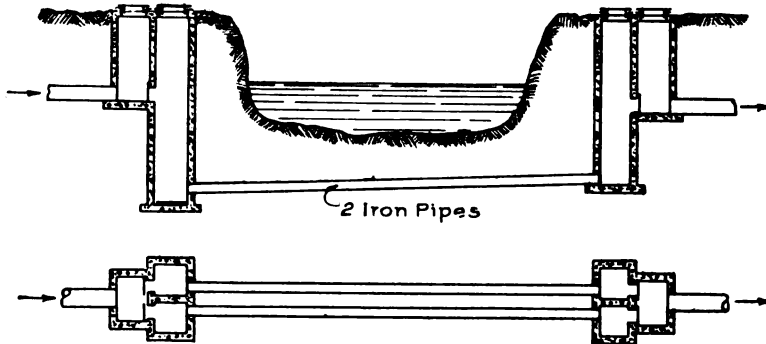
Sectional Elevation and Plan of Inverted Siphon.
